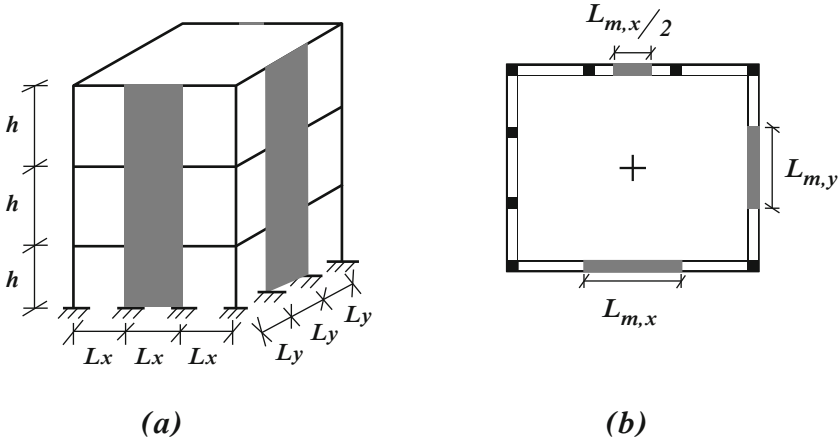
3D view (a) and plan (b) of the three-story building with four shear walls
